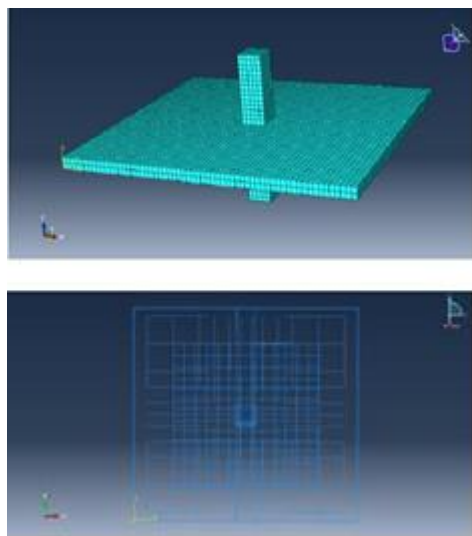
Meshing & Modeling of the slab-column joint, reinforcement.
